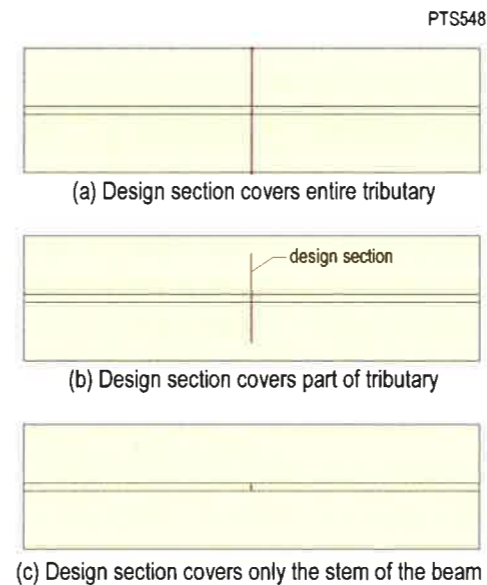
Plan of Flanged Beam Showing Different Design Section Widths
